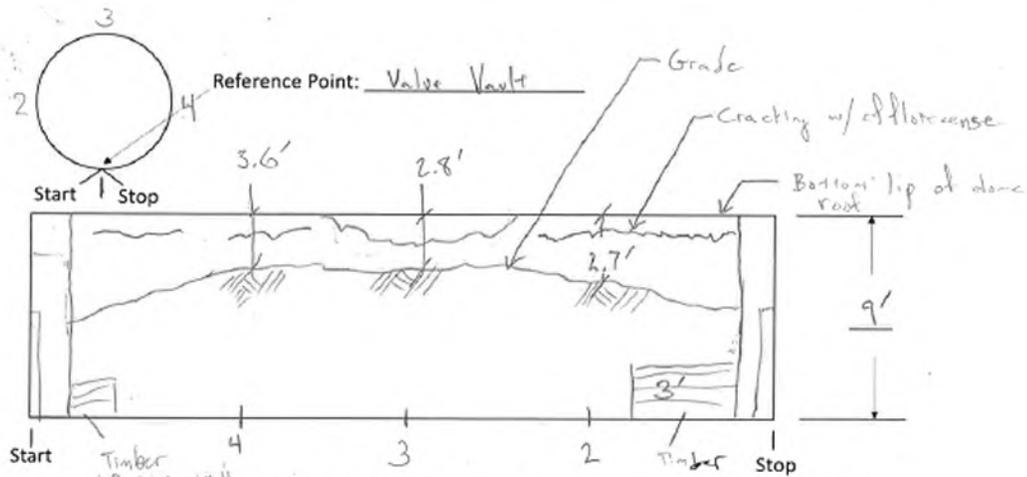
Reservoir EXTERIOR WALL Elevation– Note location of ladders and other features.
